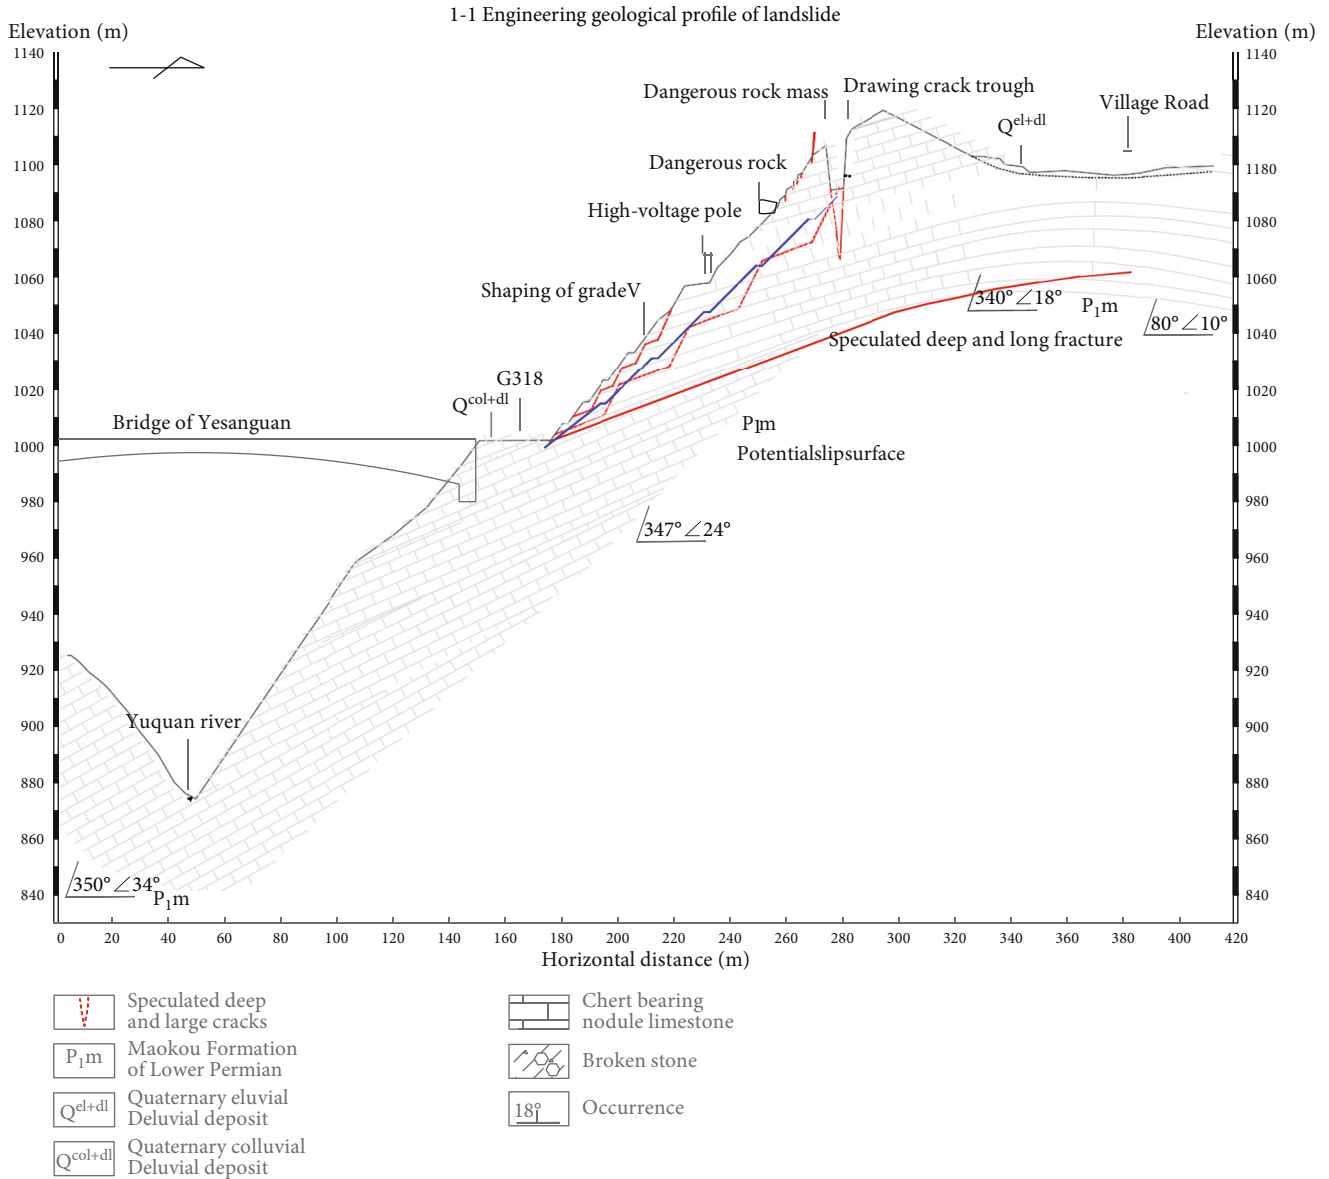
Schematic diagram of 1-1' section slope cutting.
